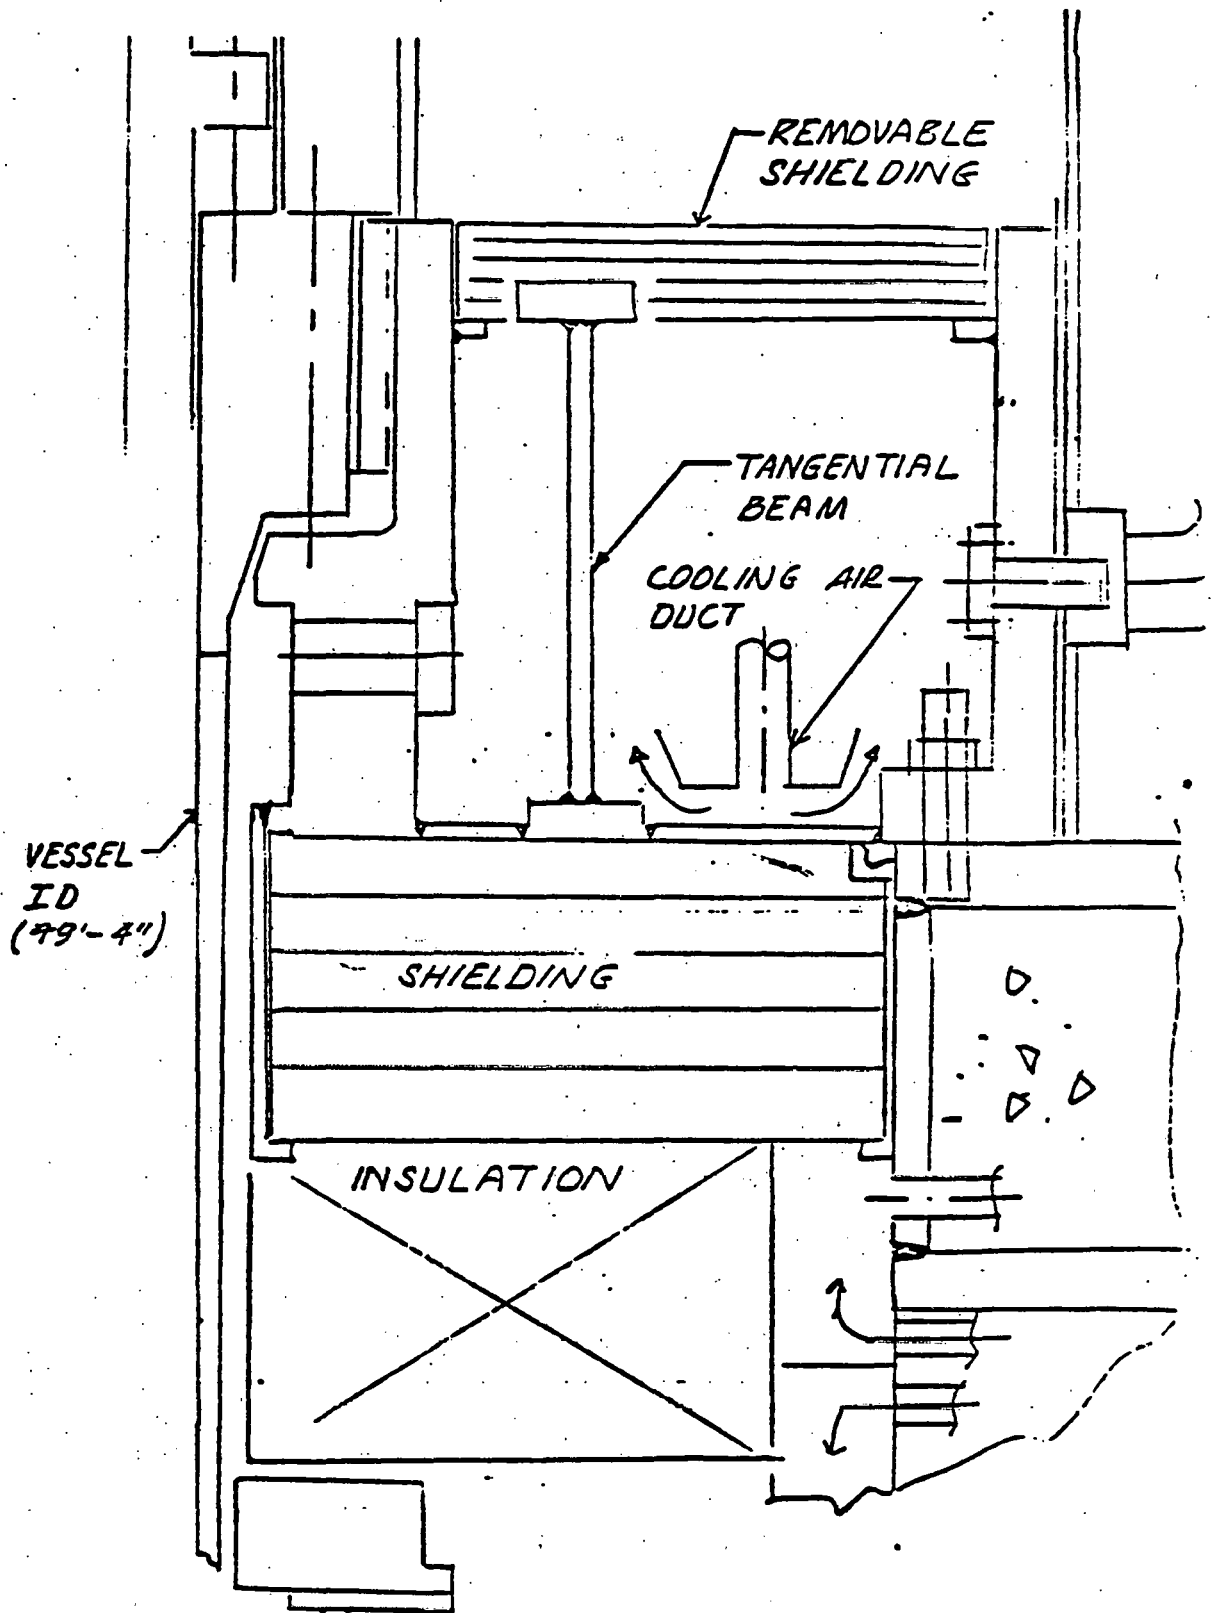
TANGENTIAL BEAM VESSEL SUPPORT STRUCTURE (ELEVATION)
